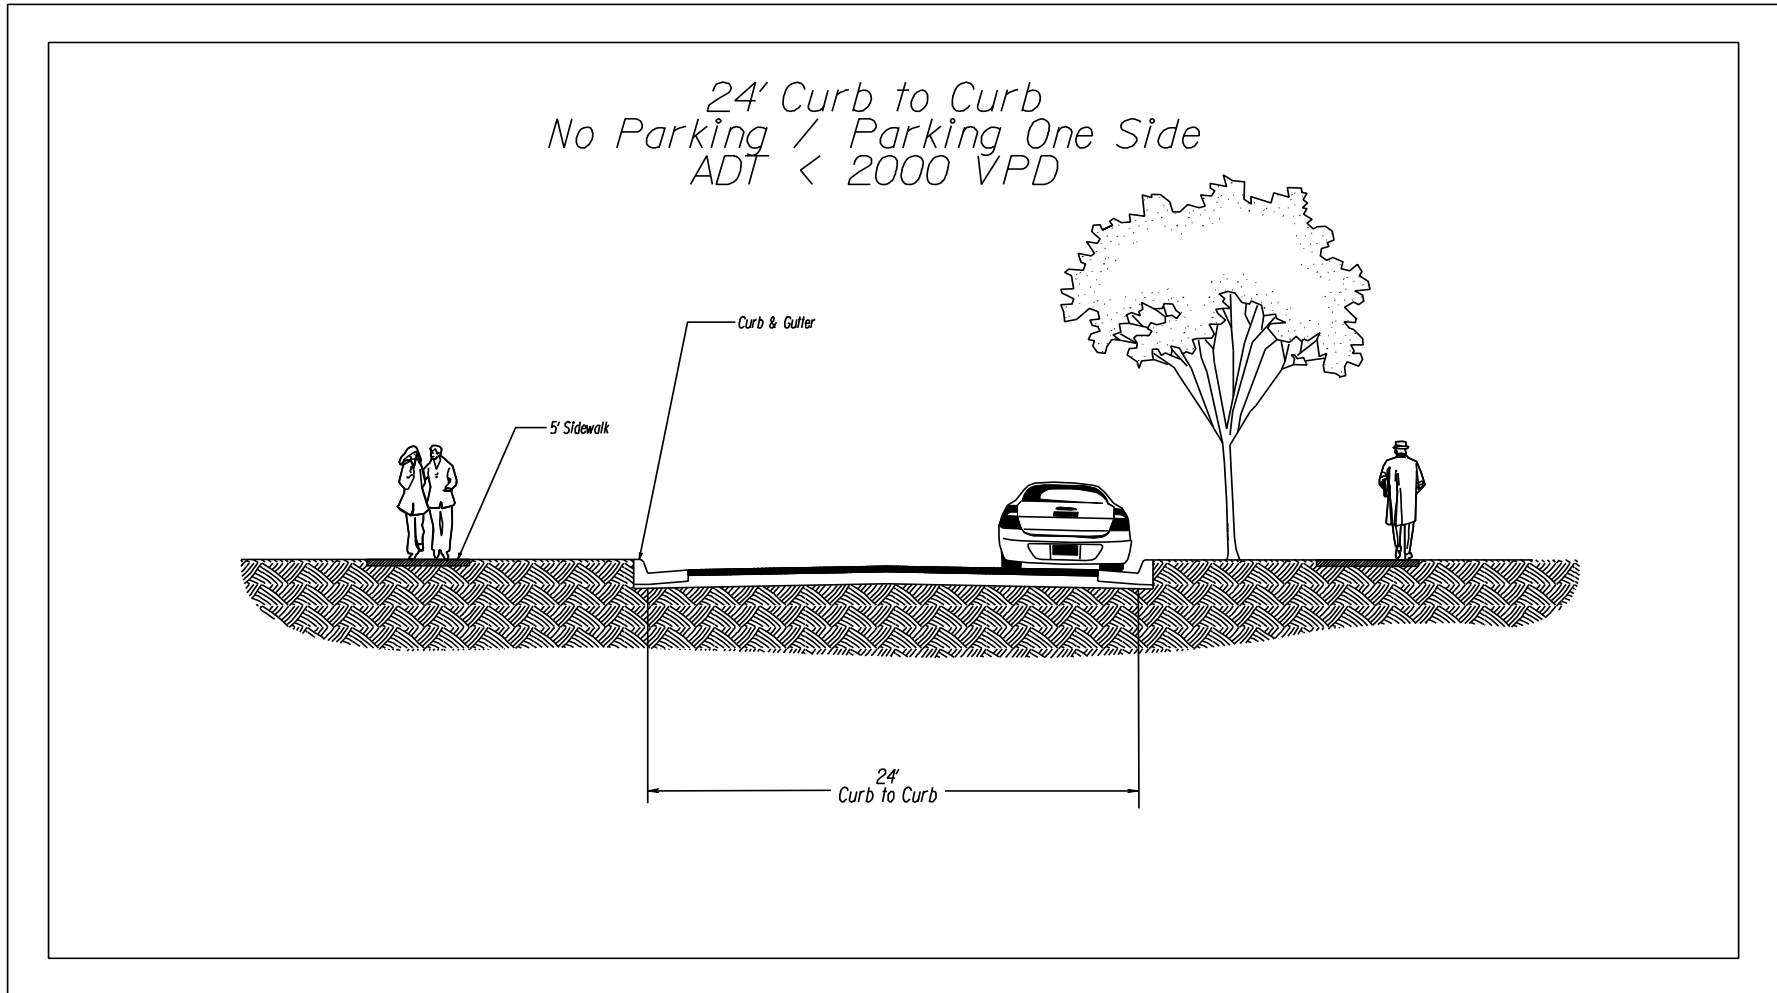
24' CURB TO CURB NO PARKING / PARKING ON ONE SIDE
